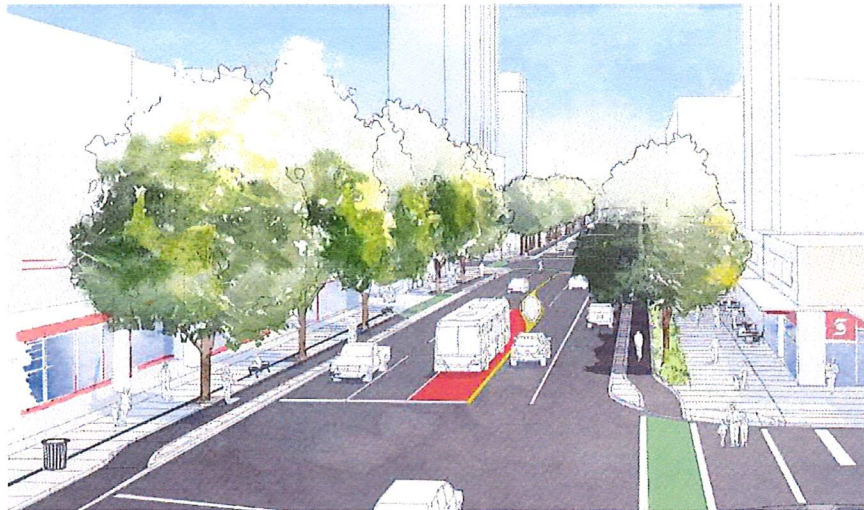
Esplanade looking east from the Rogers Overpass towards Lonsdale
